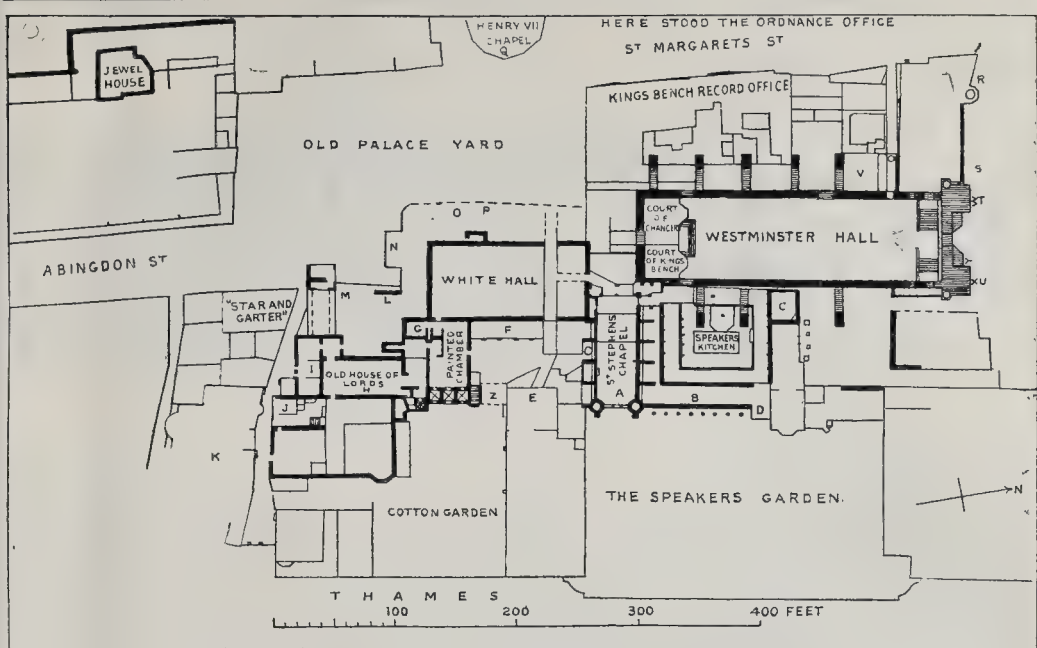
Old Houses of Parliament, Westminster Hall, &c. (From Smith's Plan.)
